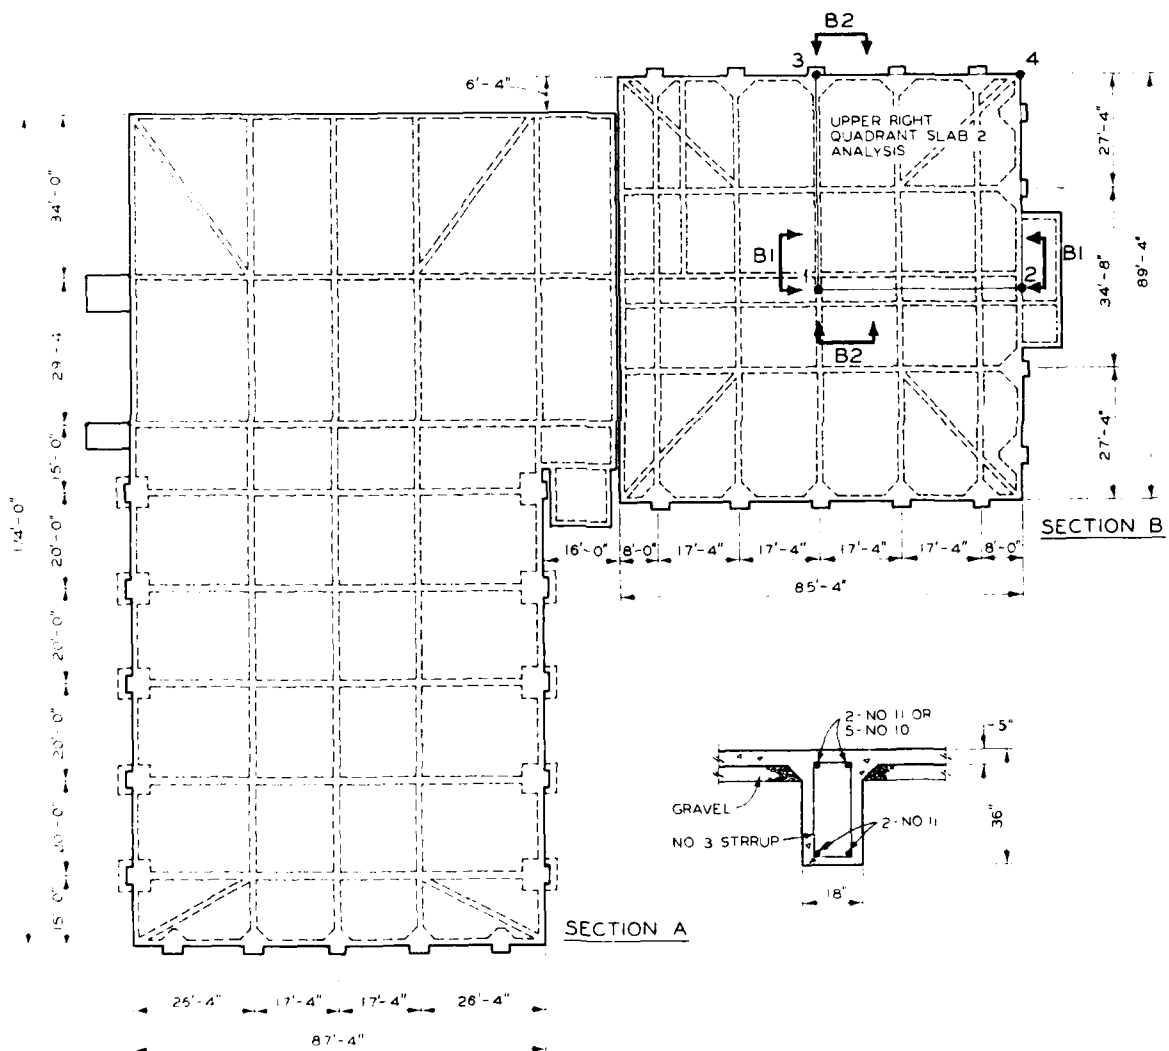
Foundation plan Brooks Air Force Base Gymnasium
